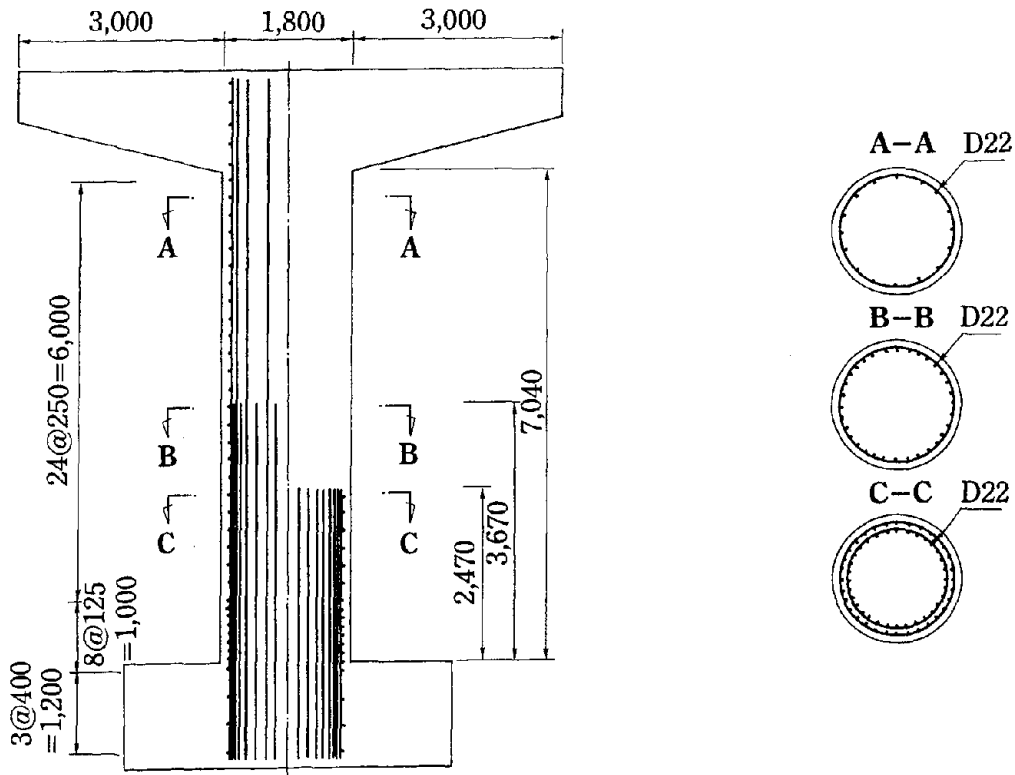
Layout of Longitudinal Reinforcement in Shin-shiriuchi Bridge Pier (Old P3)
